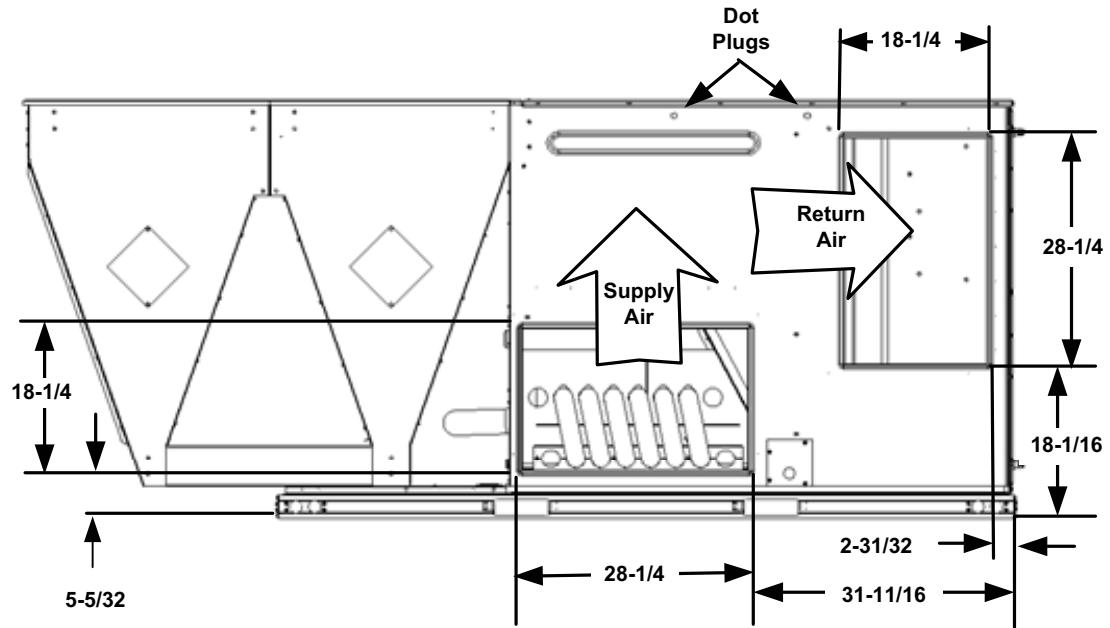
DR150 REAR DUCT DIMENSIONS
